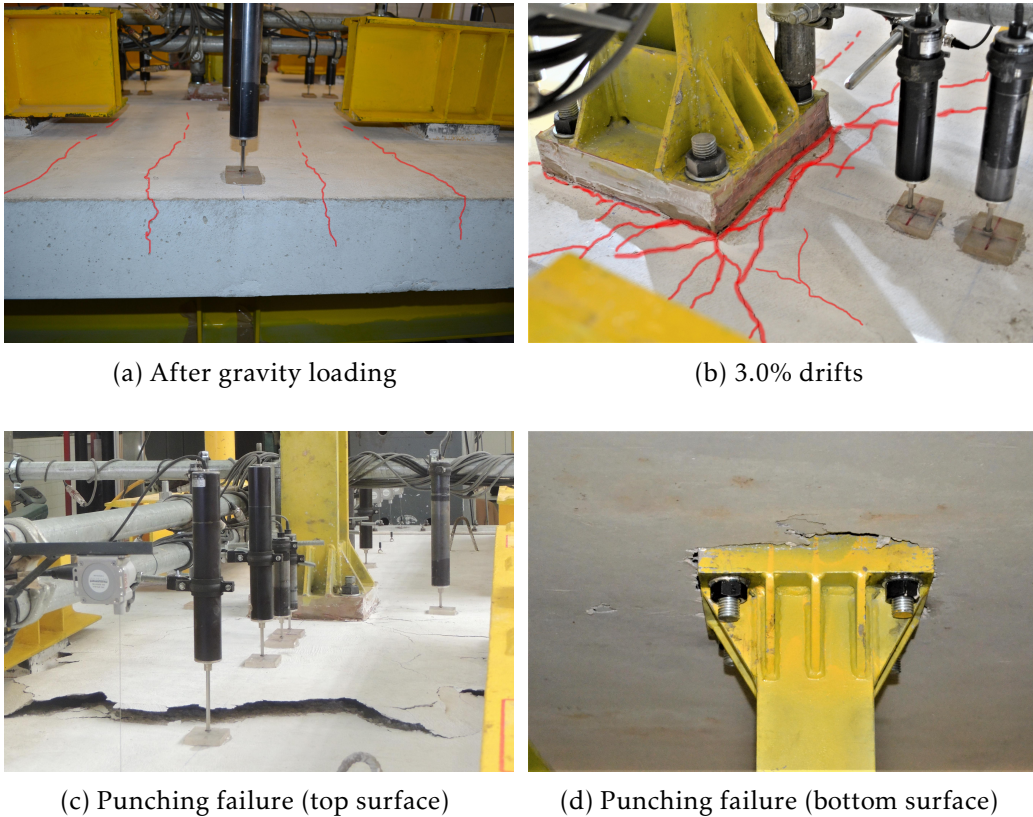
Photos during the cyclic loading test of specimen C-SSR3
